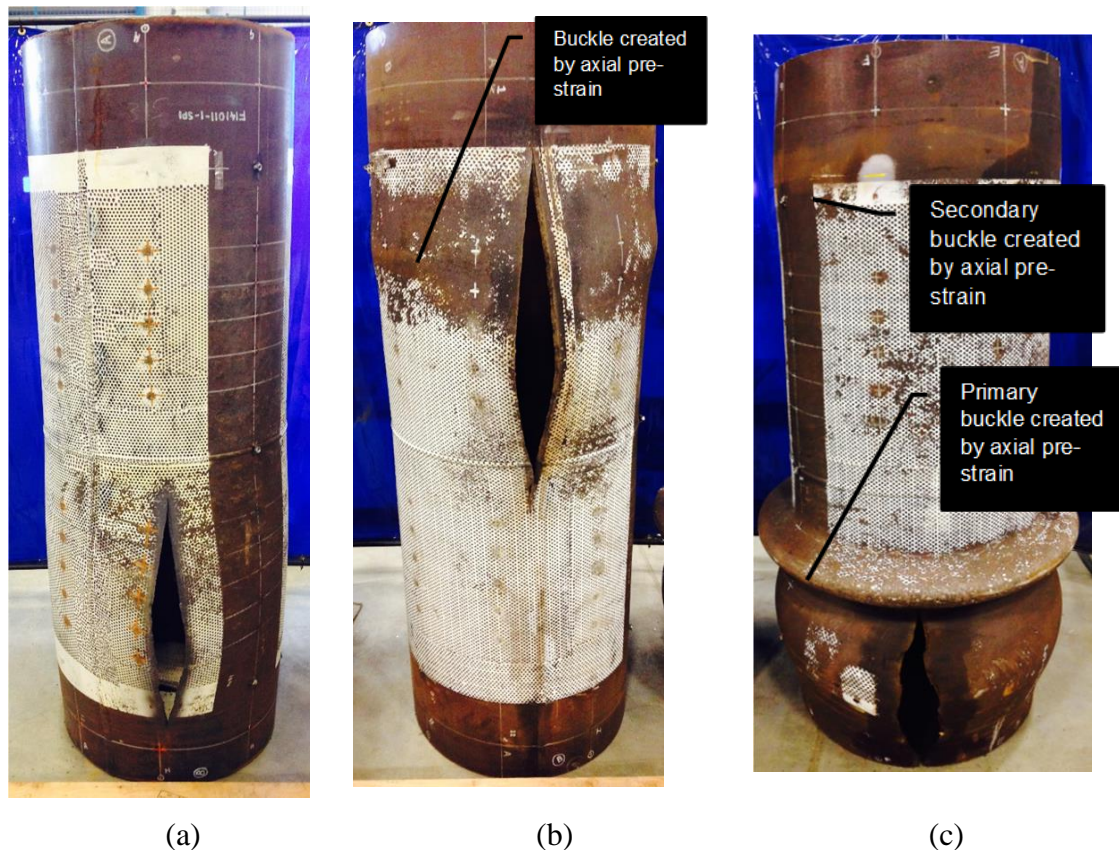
Test End Condition for Task 10 Specimens with Axial Pre-strain Compared to Reference Specimen without Pre-strain: (a) Specimen 11a, no axial pre-strain; (b) Specimen 11b, moderate axial pre-strain; (c) Specimen 11c, high axial pre-strain
